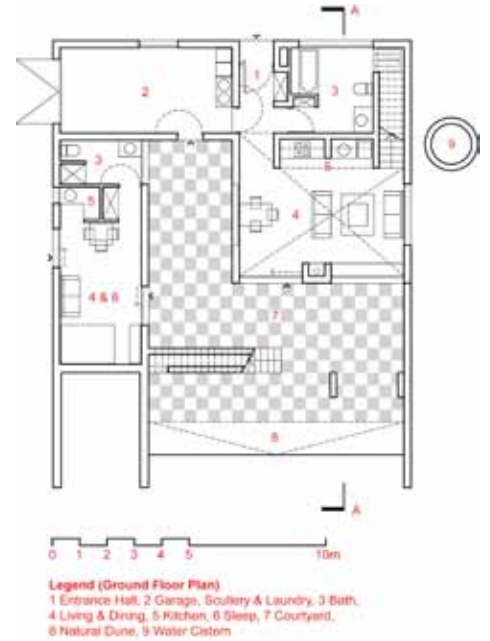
The One Megabyte House. Ground Floor Plan (horizontal cut). Drawing by Alexander Oppen, 2005.
